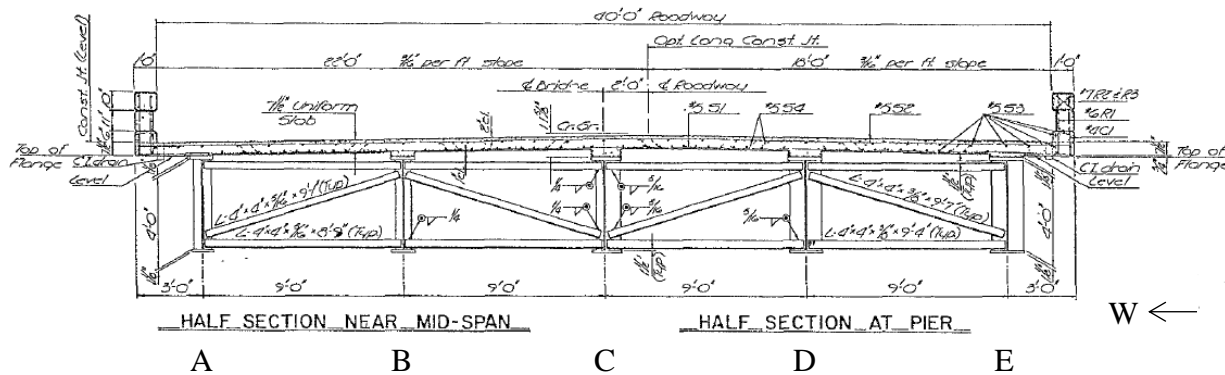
Cross-section of Kansas Bridge 135-87(043/044).
